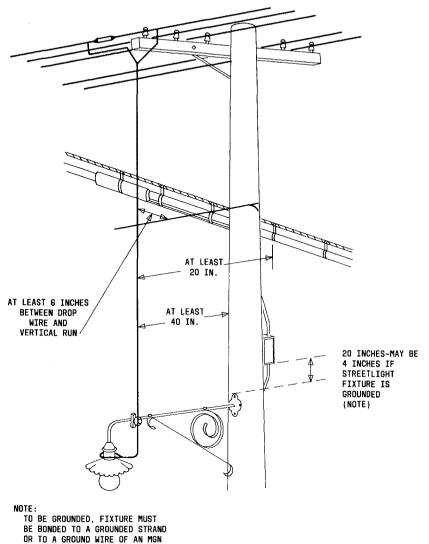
Clearances of Cable and Pole-Mounted Terminal From Streetlight Fixture Mounted Below Cable
